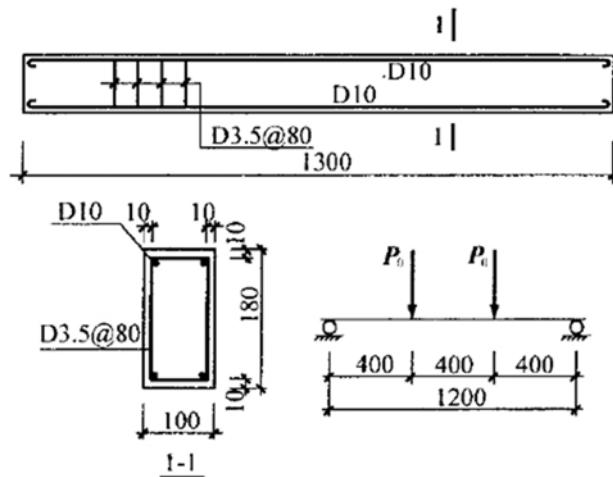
Specimen dimensions, detailing and loading positions (Shi et al., 2002)
